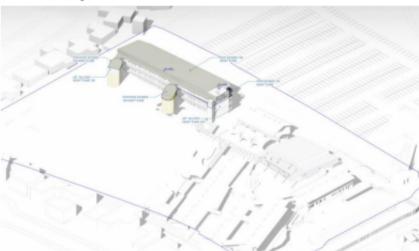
Height Plane Diagram (looking at the site from the south-west) Source: Woods Bagot
